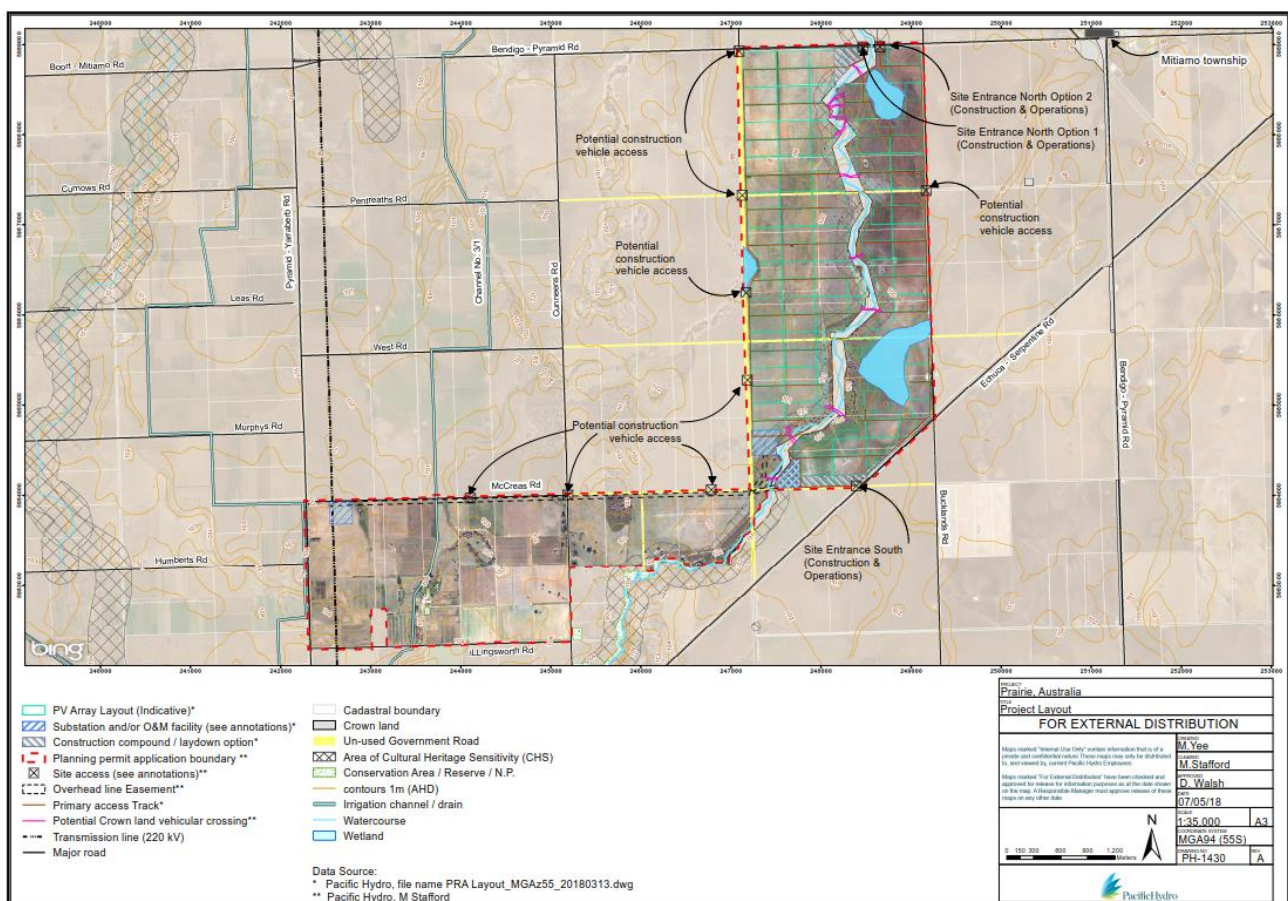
Proposed Prairie Solar Farm location and surrounding road network (Source: Pacific Hydro)
